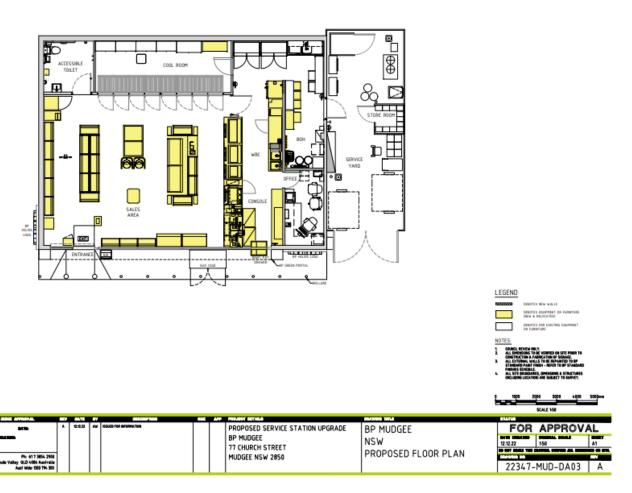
Proposed Floor Plan (Source: TfA Project Group)
